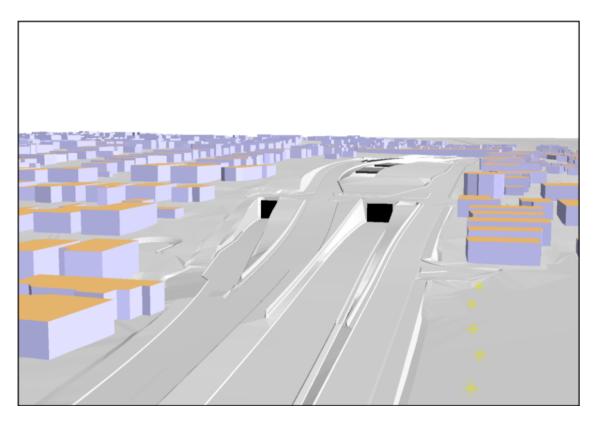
Reconfigured Wattle Street interchange (oblique elevation, facing south)
